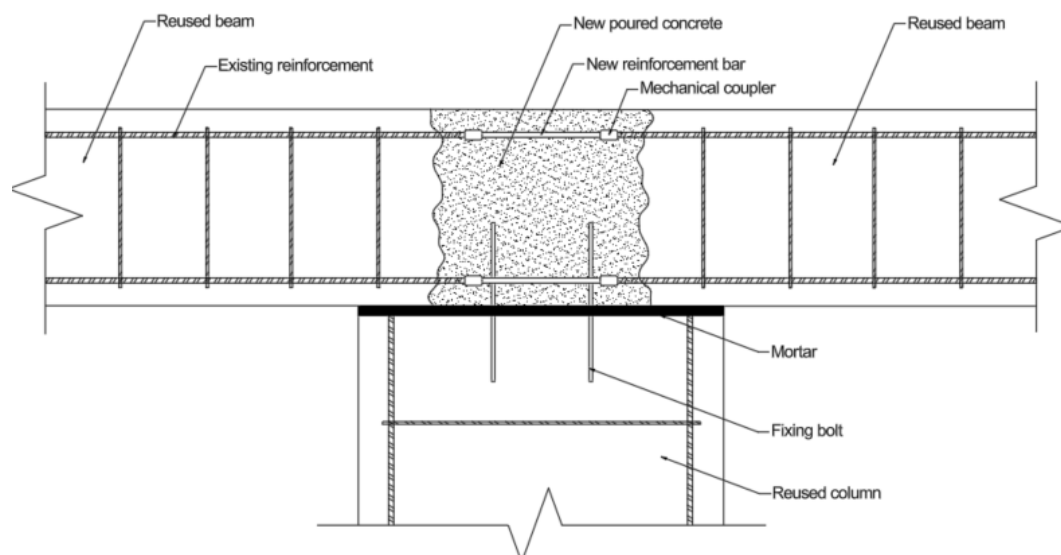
Design proposal moment-resisting double beam-to-column reconnection
